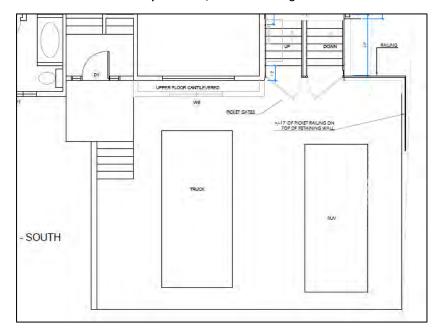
An arial view of the south of the residence with the footprint of the proposed driveway. Drawings provided by Momentum Design Build.
